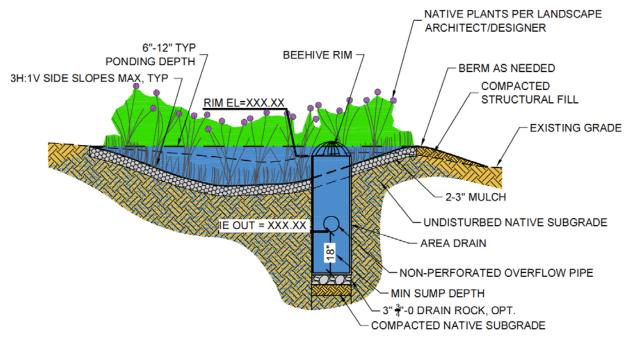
Example of an "Infiltration Rain Garden with Area Drain". In this case, the water level is above the rim elevation of the outlet because a storm larger than the design storm is overwhelming the downstream system (i.e. the non-perforated overflow pipe, which would be connected to an approved discharge point) with either intensity or volume or both. During the water quality design storm, water depth should be less than the rim elevation. Not pictured, but also applicable to the above criteria are versions of a stormwater planter or LID swale (see Appendix F Standard Details).
